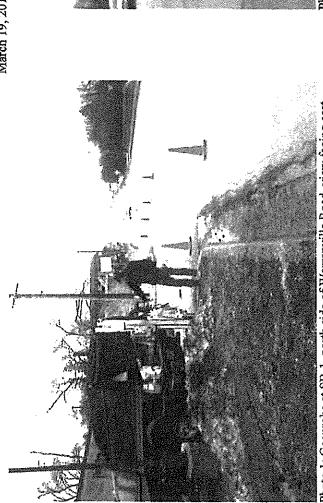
Geoprobe at SB-1, north side of Warrenville Road, view facing east
